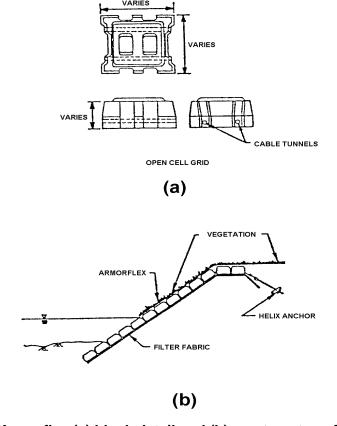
Armorflex (a) block detail and (b) revetment configuration
